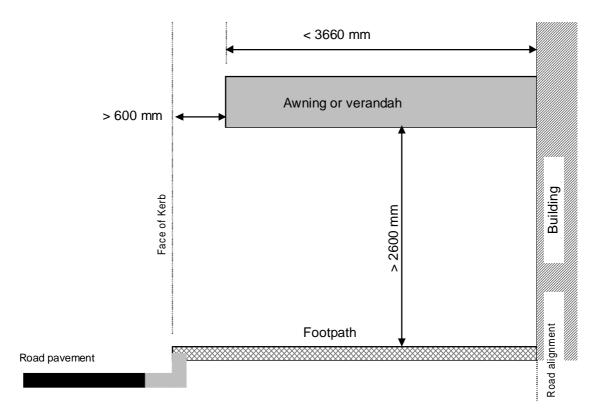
Typical elevation view of development standards for canterlever awnings or verandahs over public roads.
